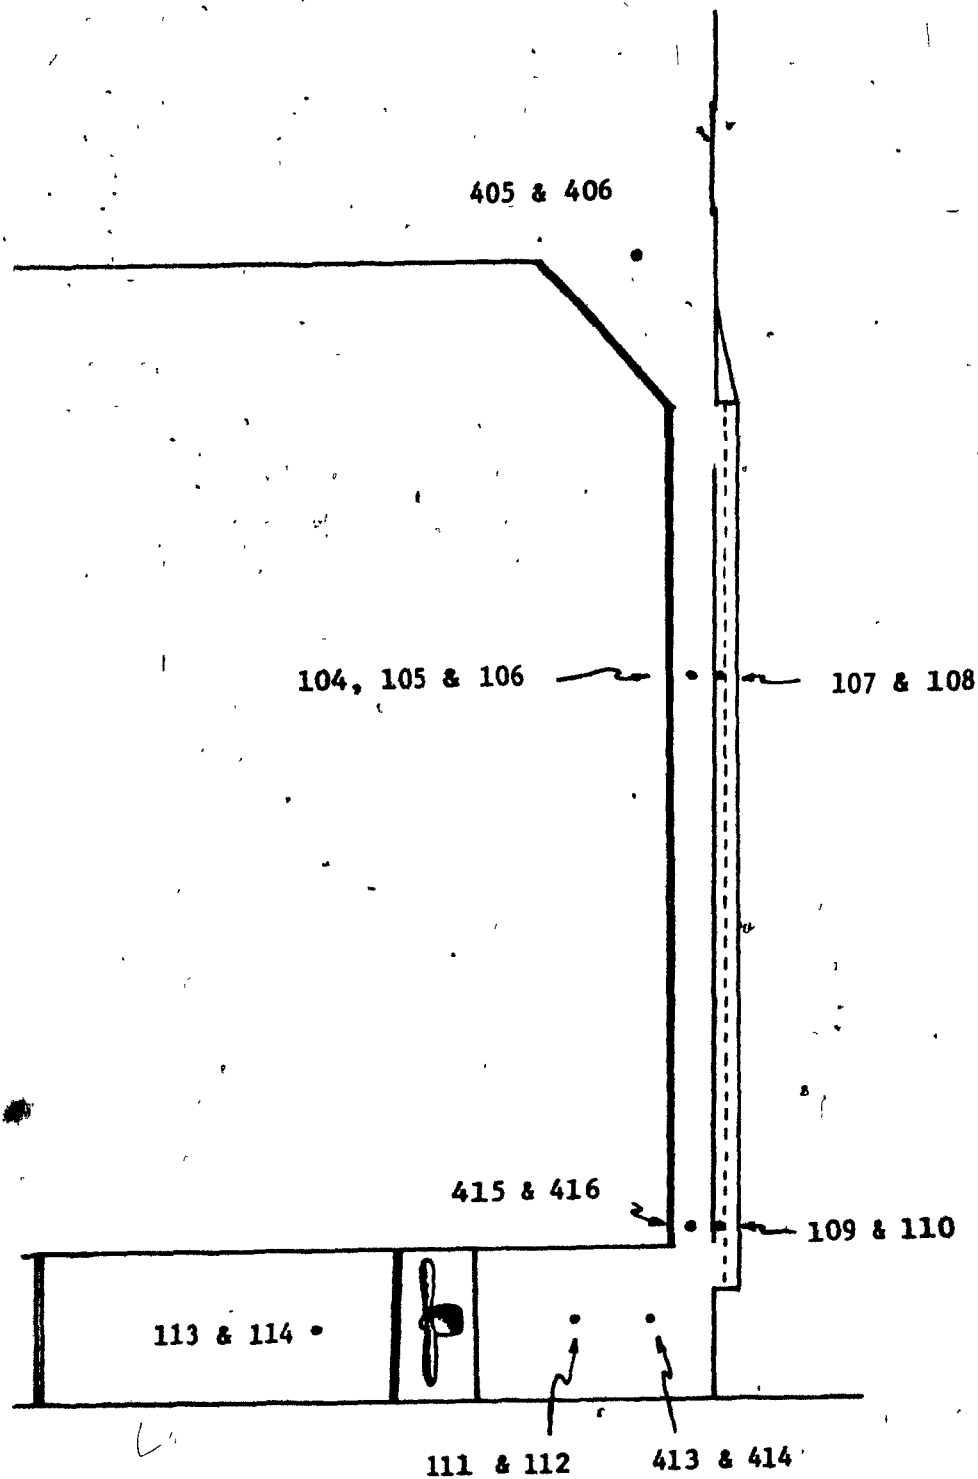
Section View of Solar Wall, By-Pass Wall and Suction Plenum showing Thermocouple Locations
